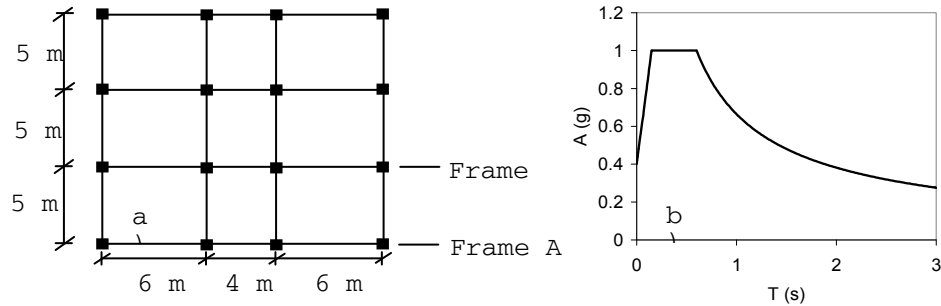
a) Typical plan of the 12 story building, b) design spectrum
